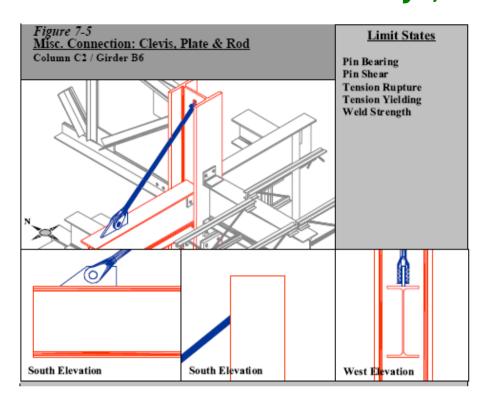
Misc. Connection: Clevis, plate & rod Column C2 / Girder B6
